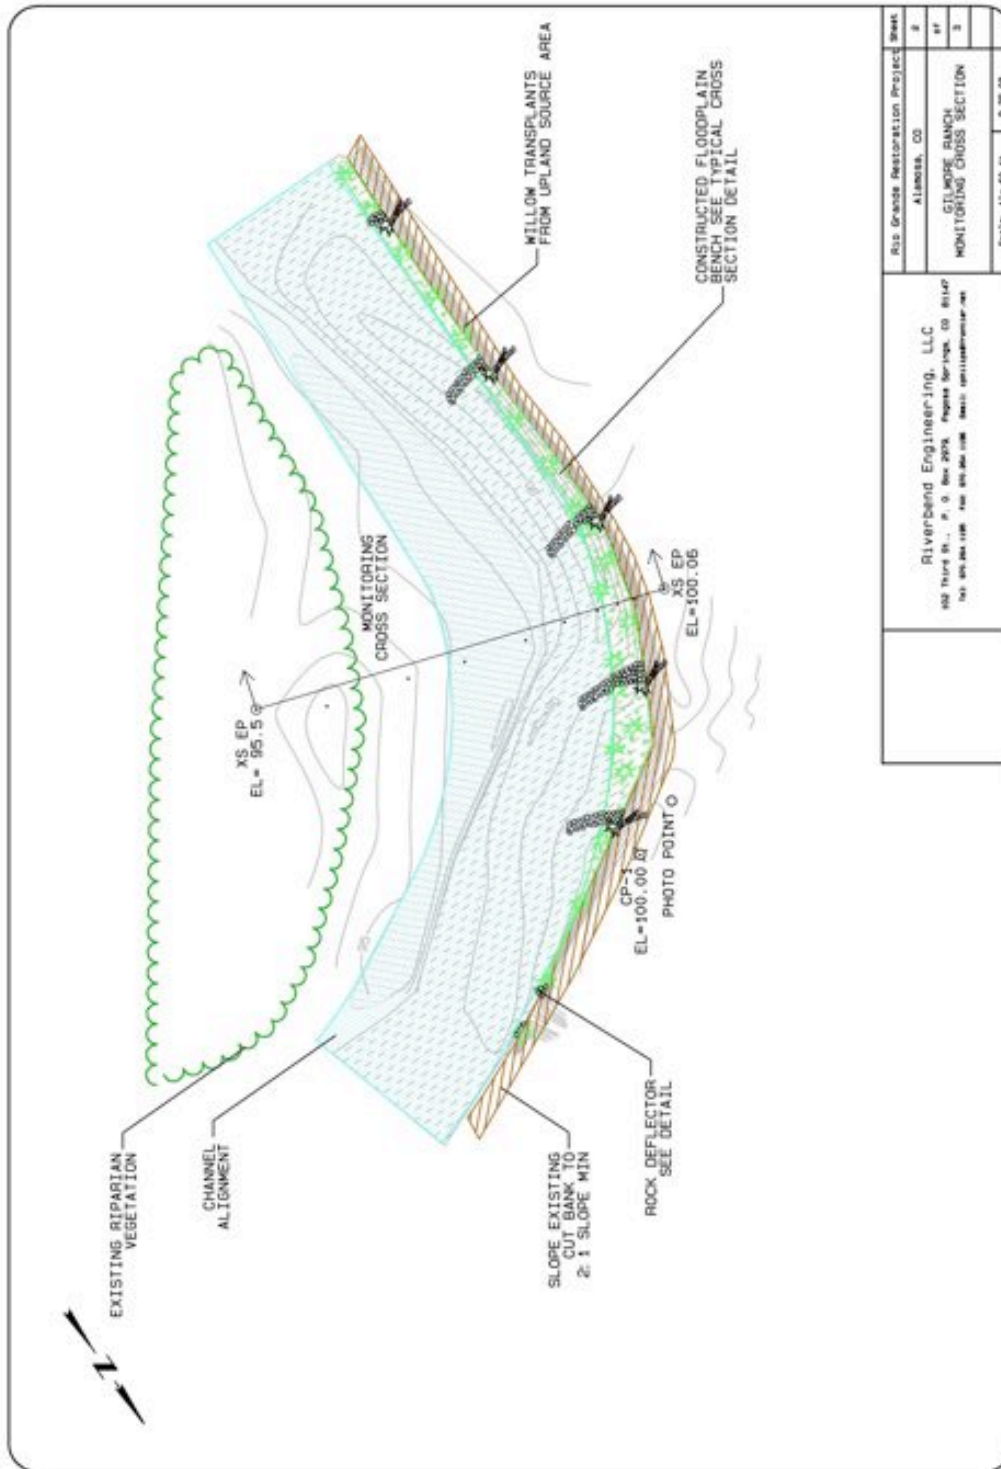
Gilmore Site Design, Cross Section Location, and Photopoint Location.
